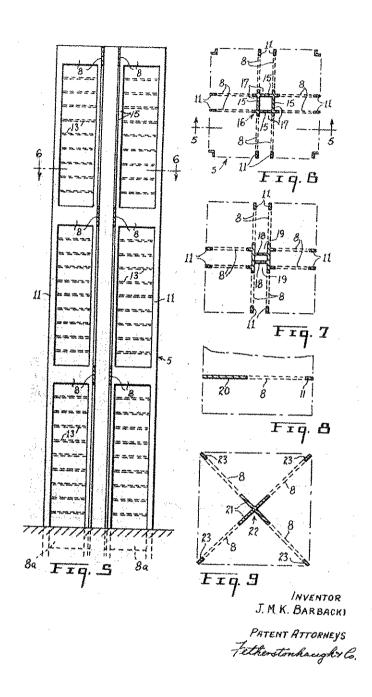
Jacek M. K. Barbacki, Wind and Frame Earthquacke T-Frame system for building", drawing 2, patent n. 659142, CIPO. (Photo available on: cipo.gc.ca)
